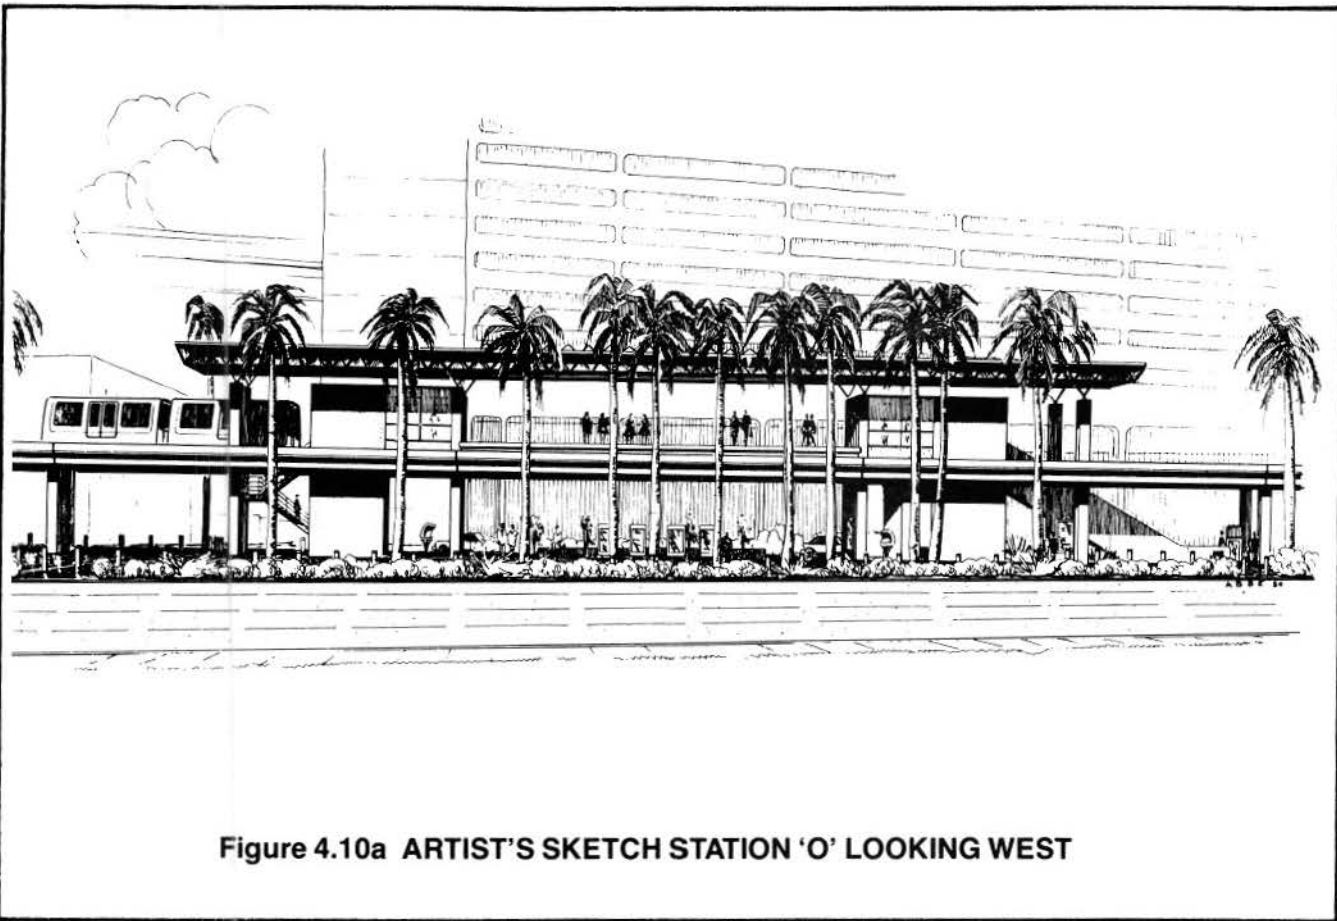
ARTIST'S SKETCH STATION 'O' LOOKING WEST
